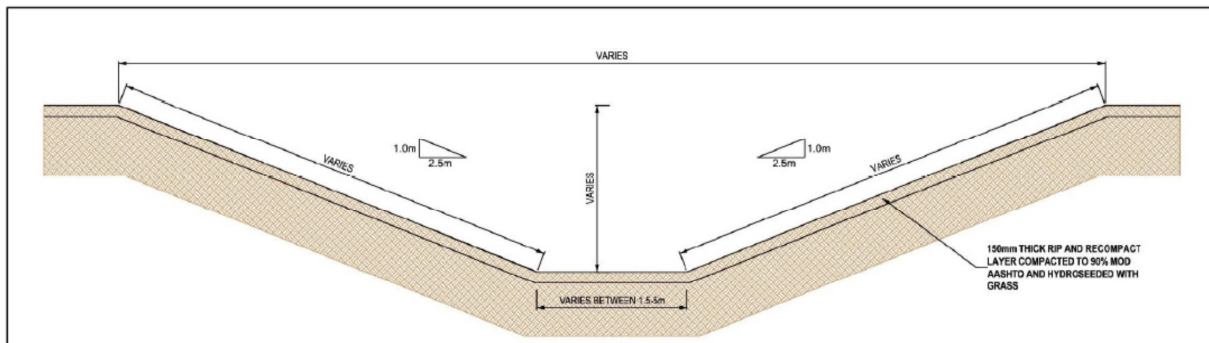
The typical cross section of the trapezoidal channel with side slopes of 1:2.5.
